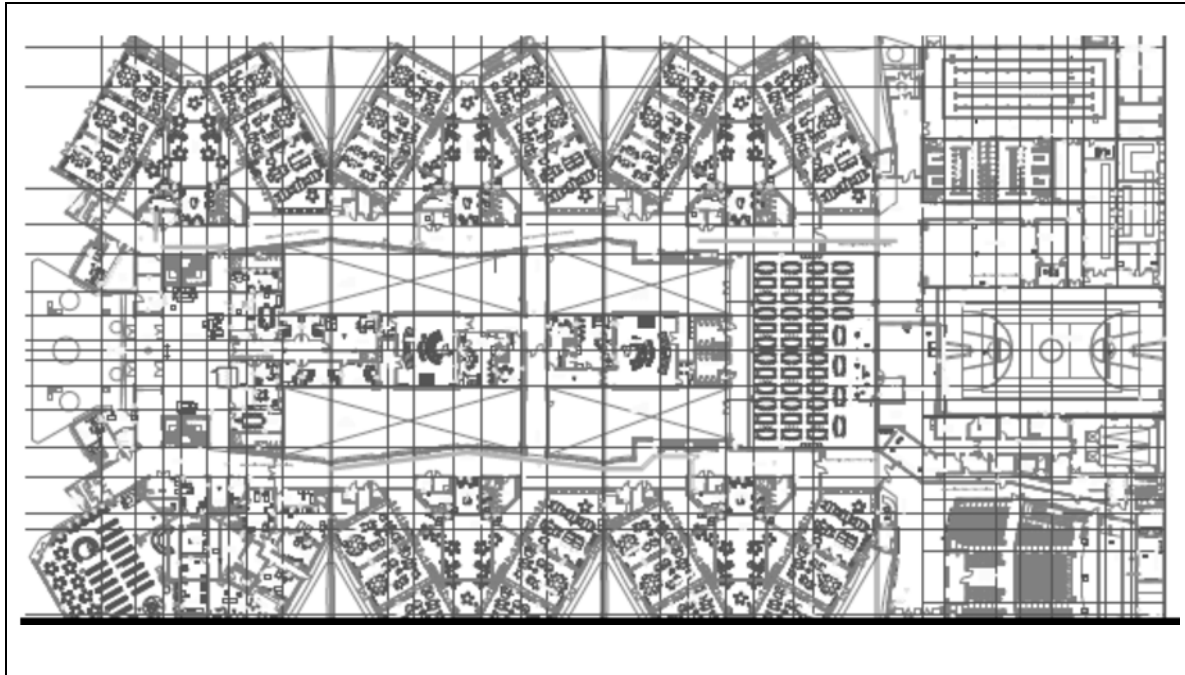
Ground Floor Plan Thumbnail of Building-1
